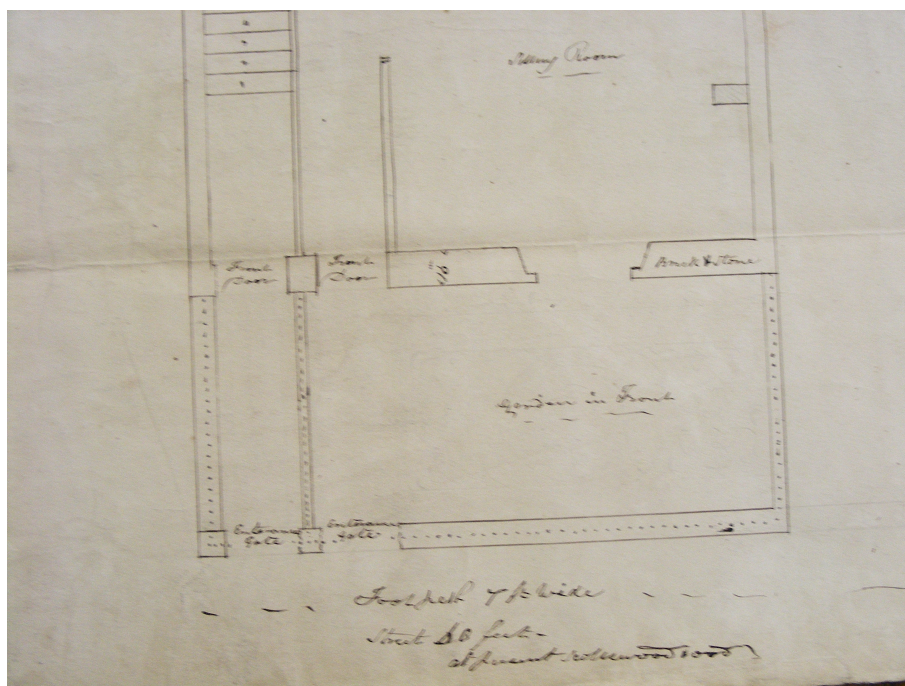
Details of Internal Plan, Scotswood Road, (T186/30)
